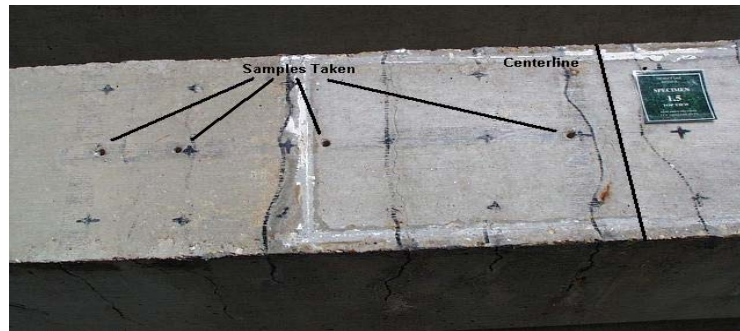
Non-PS and 2/3 PS Beam Concrete Sample Locations
